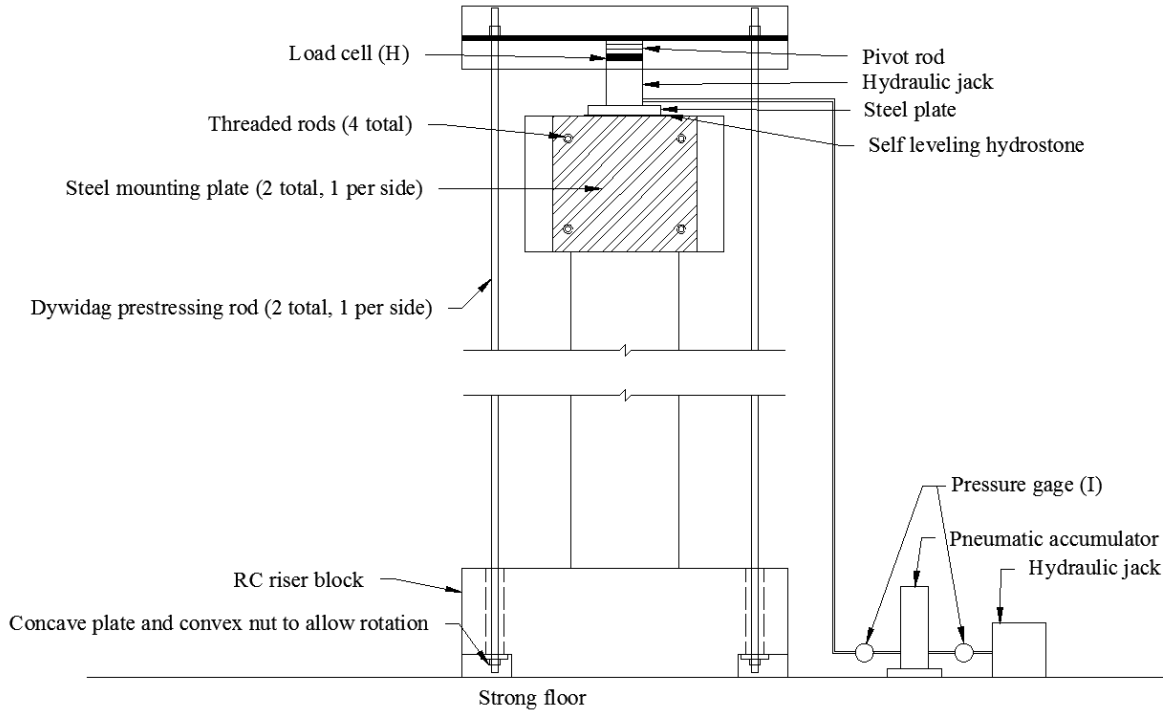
Column C1, C2, C3 and C4 south elevation of test setup
